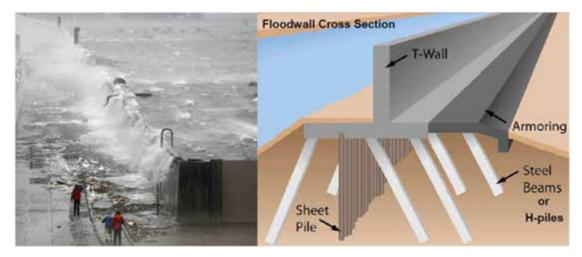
Hurricane Gustav's surge impact on New Orleans on a floodwall (tampabay.com) and a cross section of the floodwall
